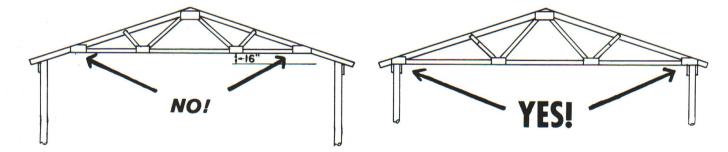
Two types of roof trusses used in Michigan Farm Buildings (incorrect - left; correct - right).
